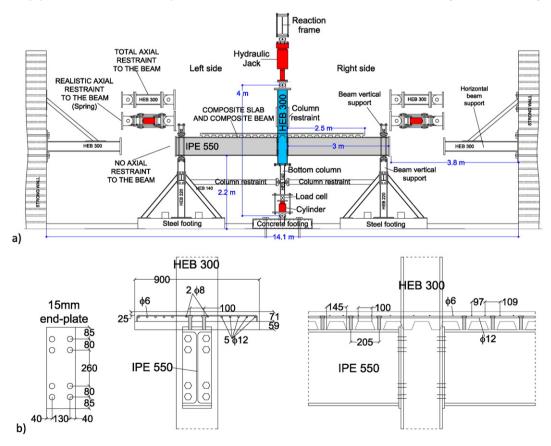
a) General layout, longitudinal view; b) Composite beam-to-column joint.
